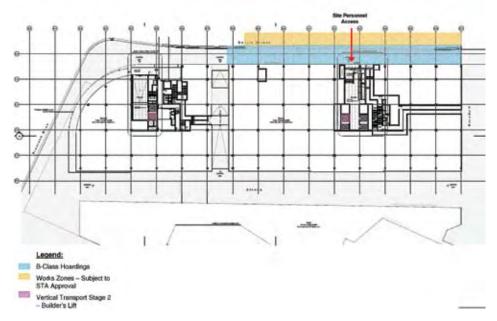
Location of Construction Zone for Commercial Buildings A and B along Devlin Street
